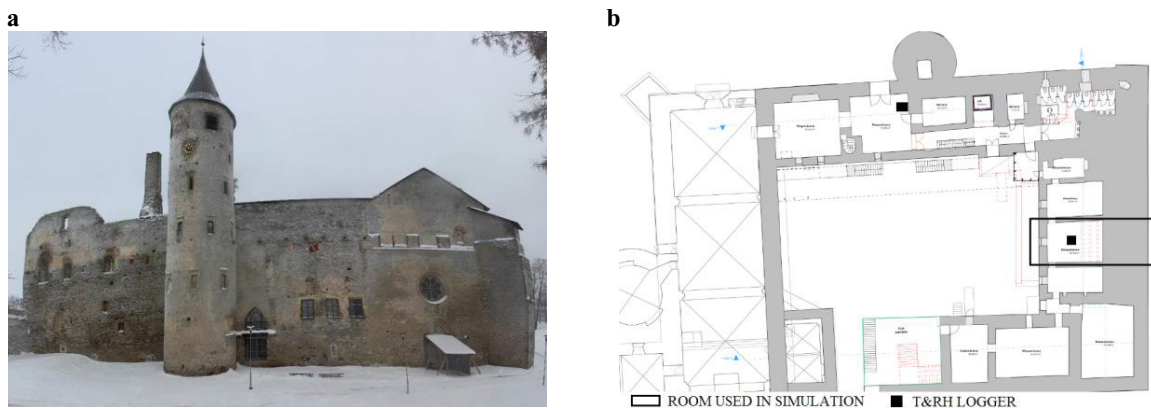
(a) Episcopal Castle of Haapsalu; (b) first floor plan view of the castle
